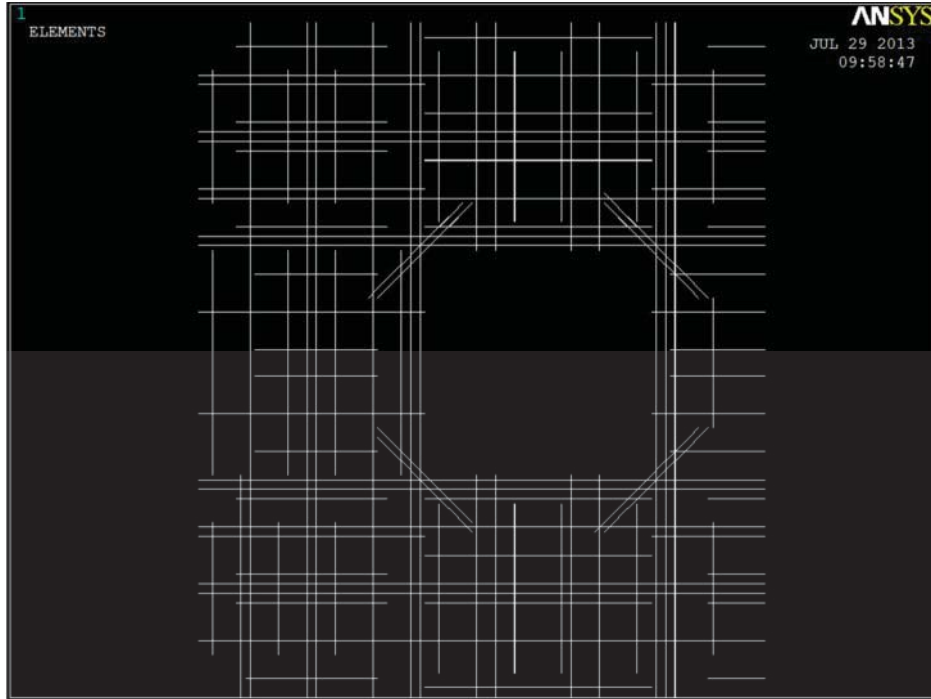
25% Opening with Diagonal Rebars at Corners
